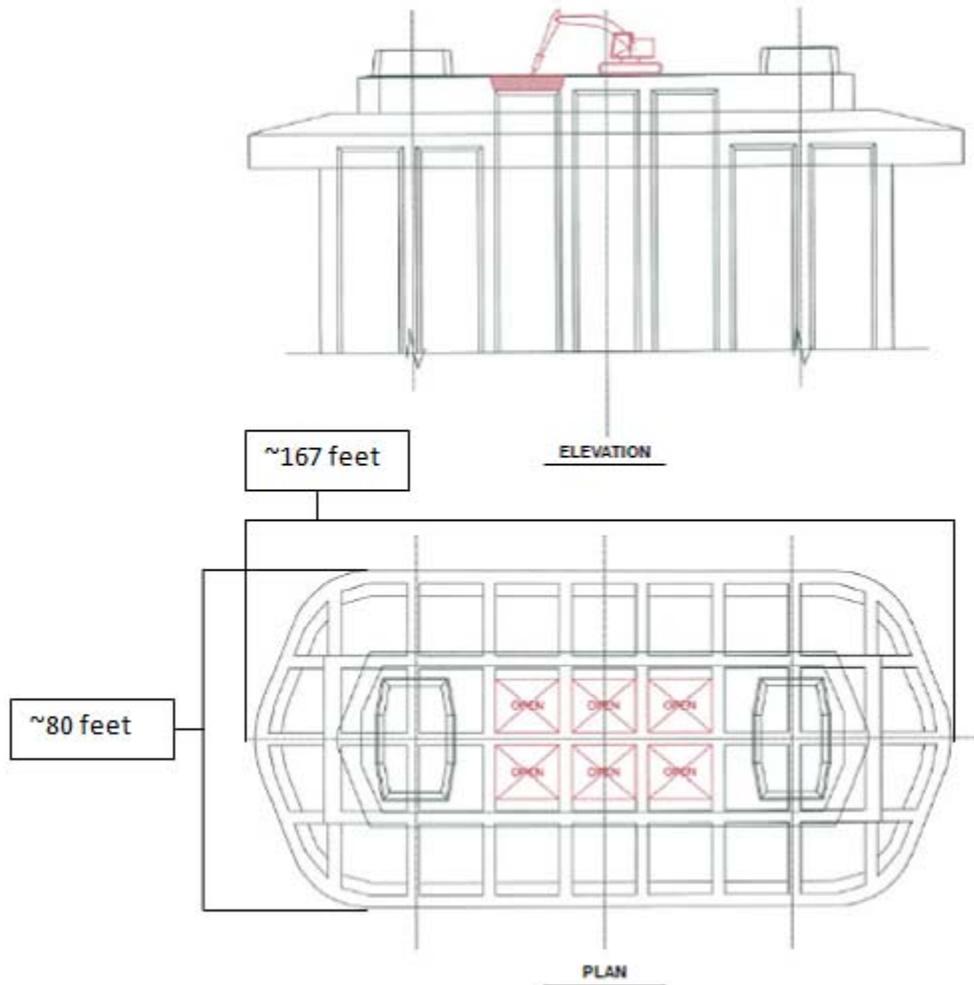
Draft plan sheet of Pier E3 caisson showing elevations, dimensions, and limits of removal.
